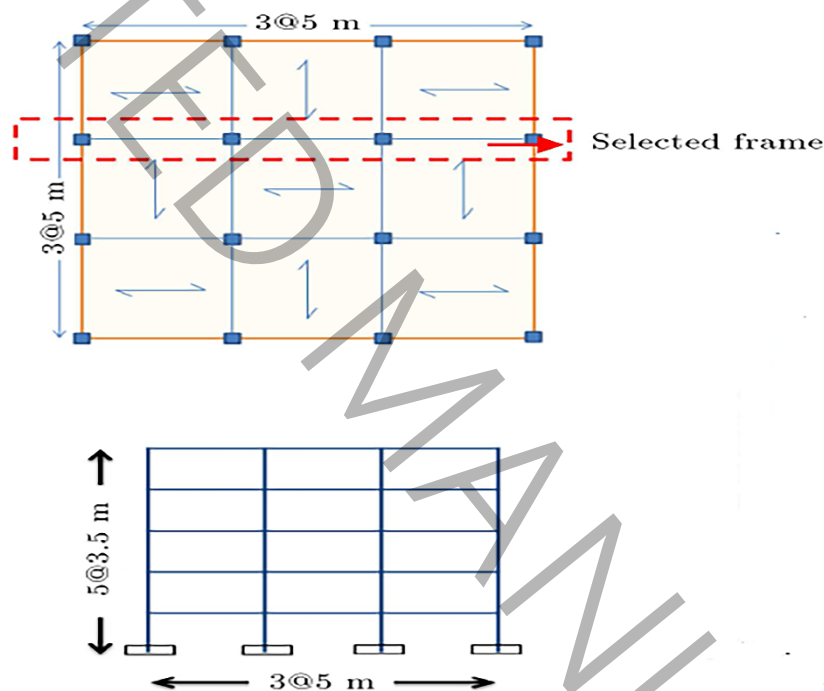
Geometry and Dimensions of the Plan and Elevation of the Studied Steel Frame [12]
